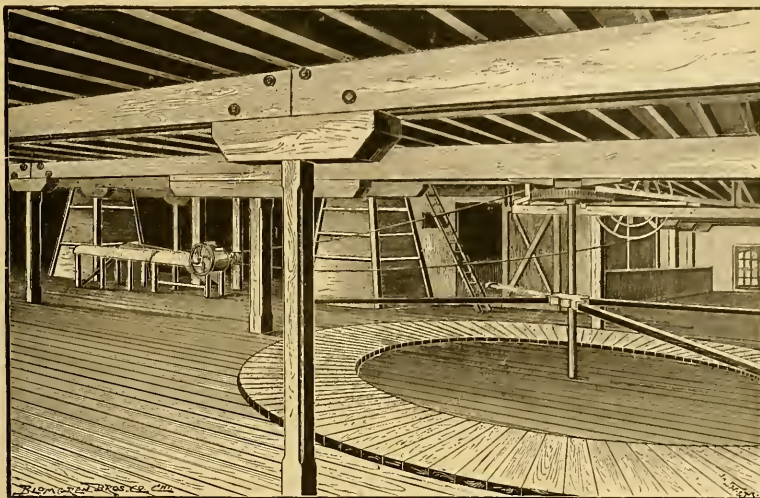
ELEVATION OF FEEDING DEPARTMENT.
